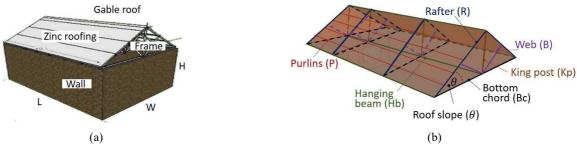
The prototype of the analyzed building: a. 3D building Presentation, b. Gable roof construction with truss roof framing
